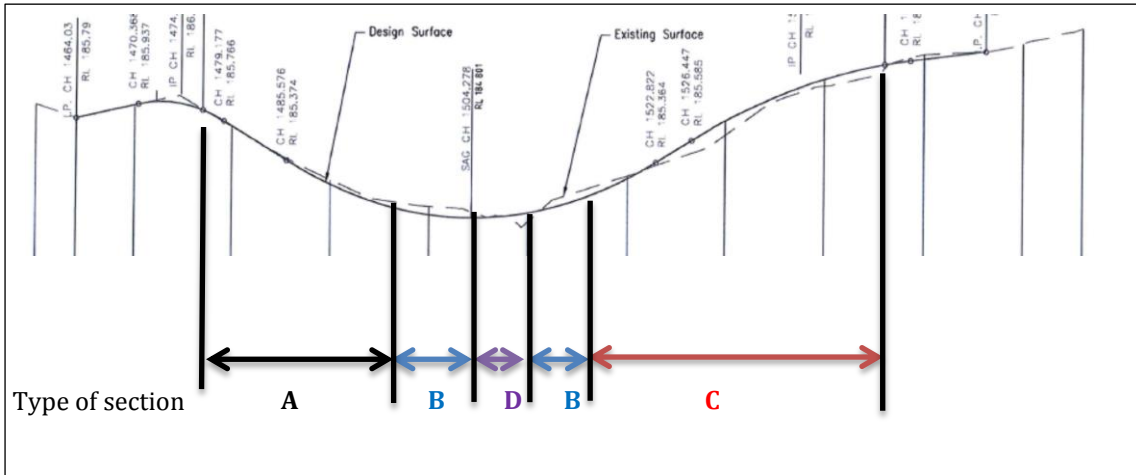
FIGURE INDICATING ZONES WITH DIFFERENT FLOODWAY SECTIONS [17]
